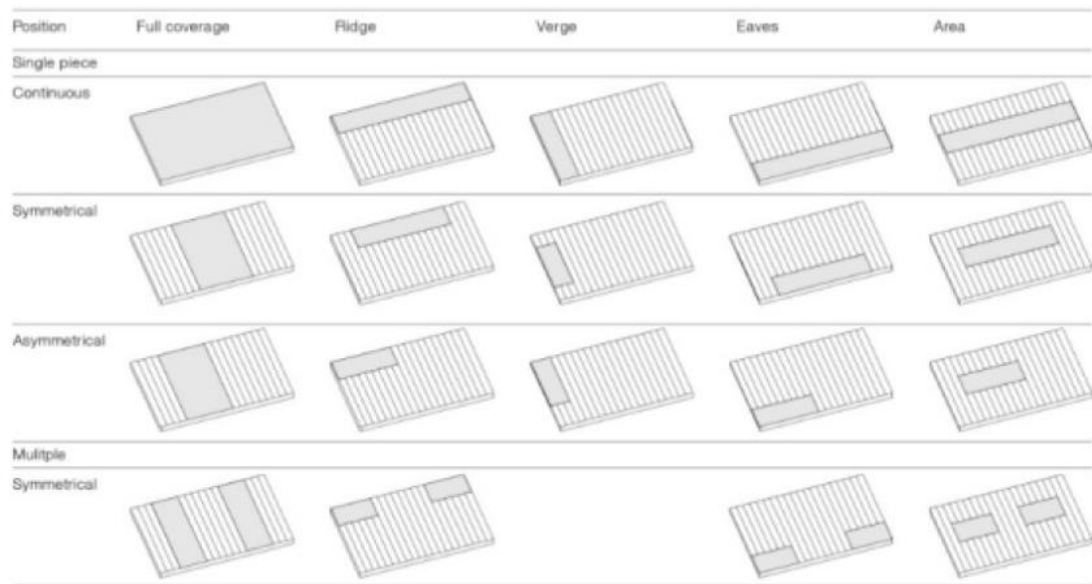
Several Configurations of PV Building Product within Roof or Façade (URL 26)
